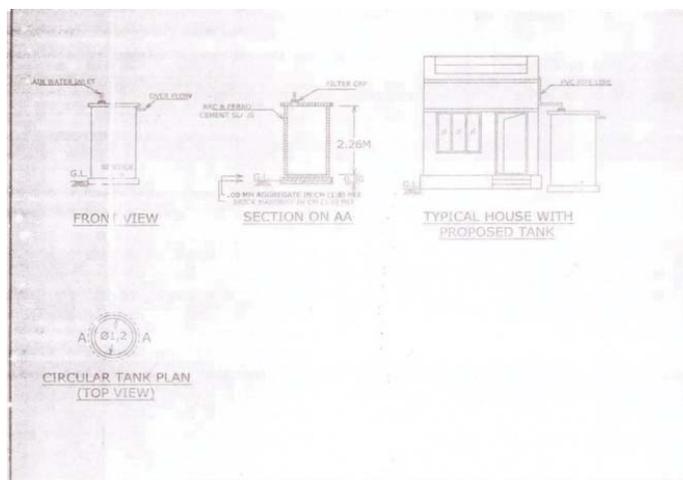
Proposed drawing for Roof Top Rainwater Harvesting Structure
